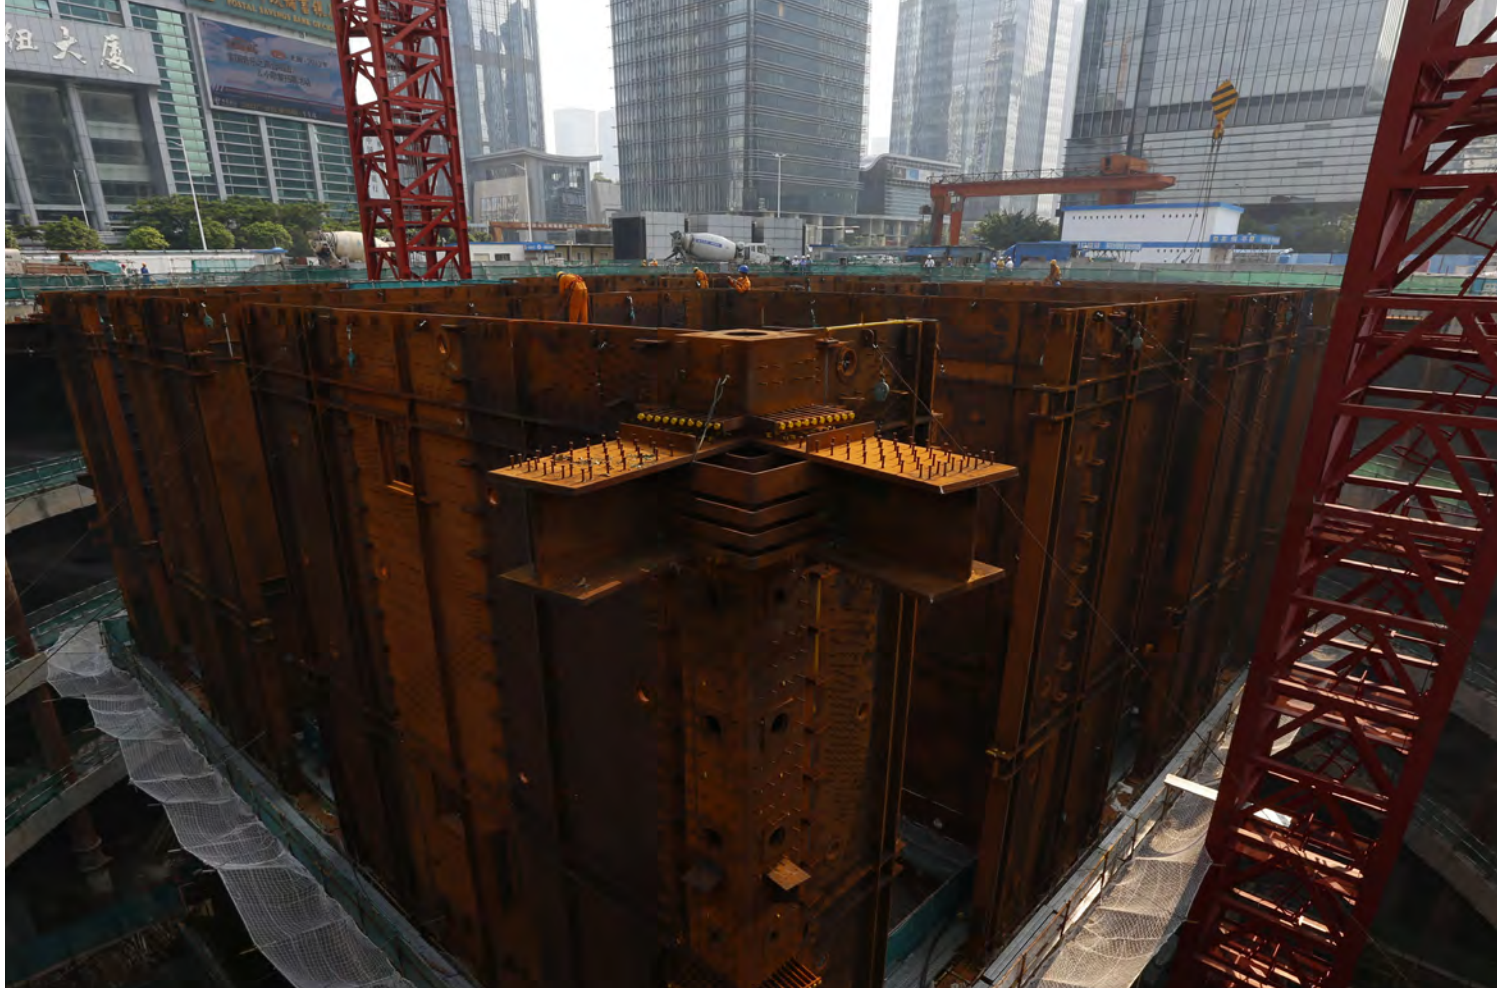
The high-strength structural steel used in the construction (Source: Ping An)
